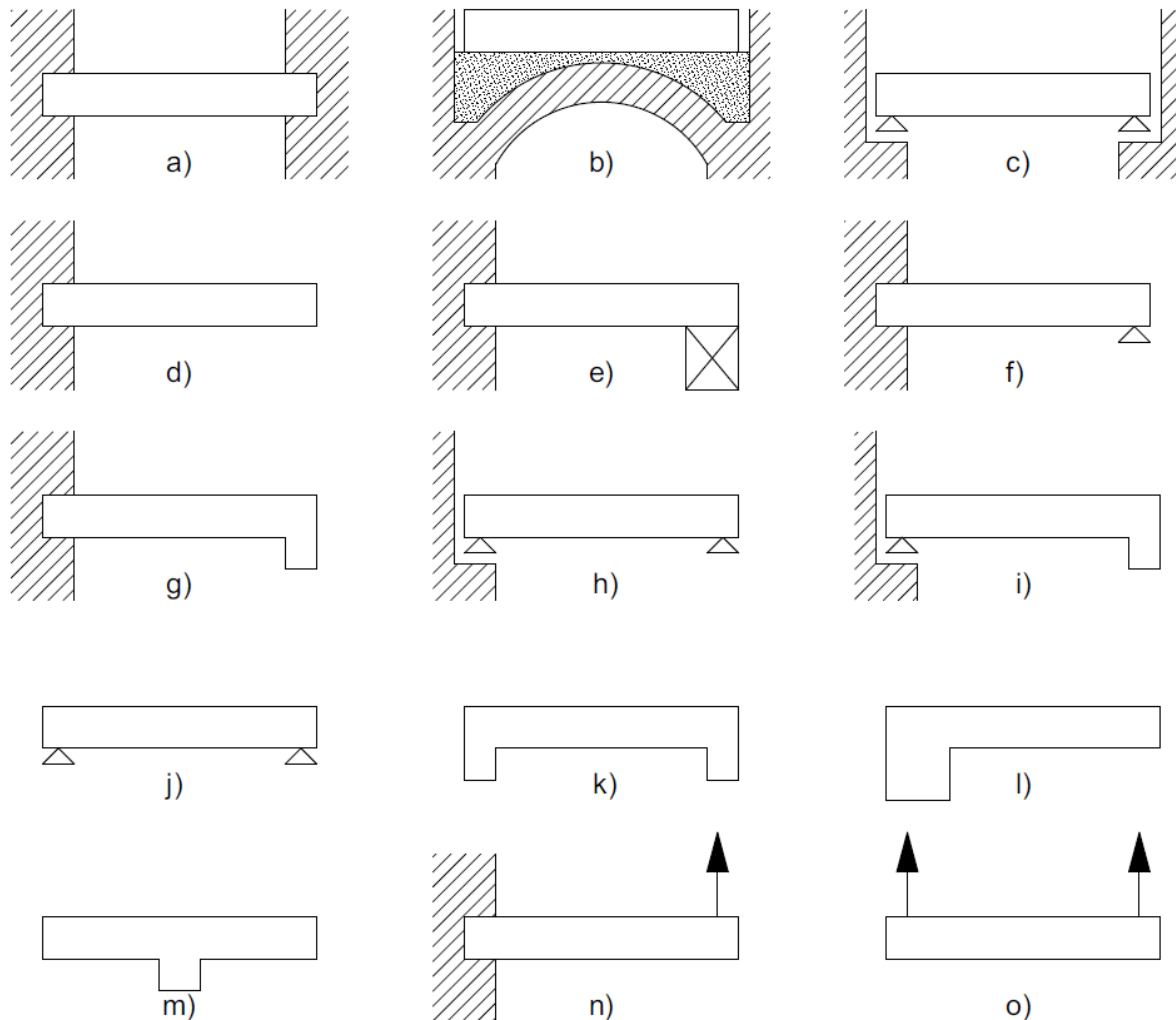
a) wall-restrained stairs, b) vaulted stairs, c) wall supported stairs, d) cantilevered floating stairs, e) wall-restrained and arch supported stairs, f) wall-restrained and beam supported stairs, g) wall-restrained with edge beam, h) stairs with wall and beam support, i) stairs with wall support and edge beam, j) stairs with beam support, k) stairs with edge beams, l) stairs with edge beam, m) stairs with center beam, n) wall-restrained and suspended stairs, o) suspended stairs
